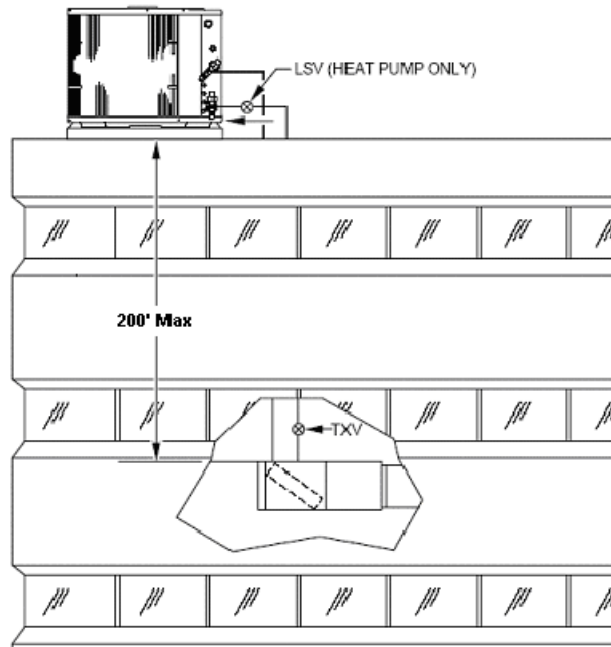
R-22 System Outdoor Unit Above Indoor Unit
